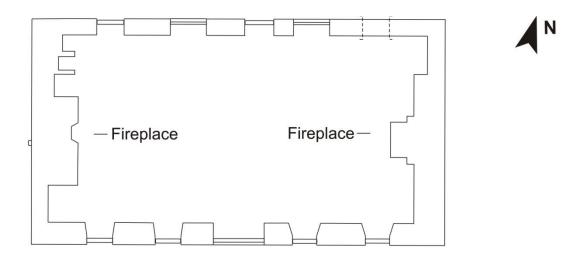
Overdale, Upper Storey Plan Scale 1:100
